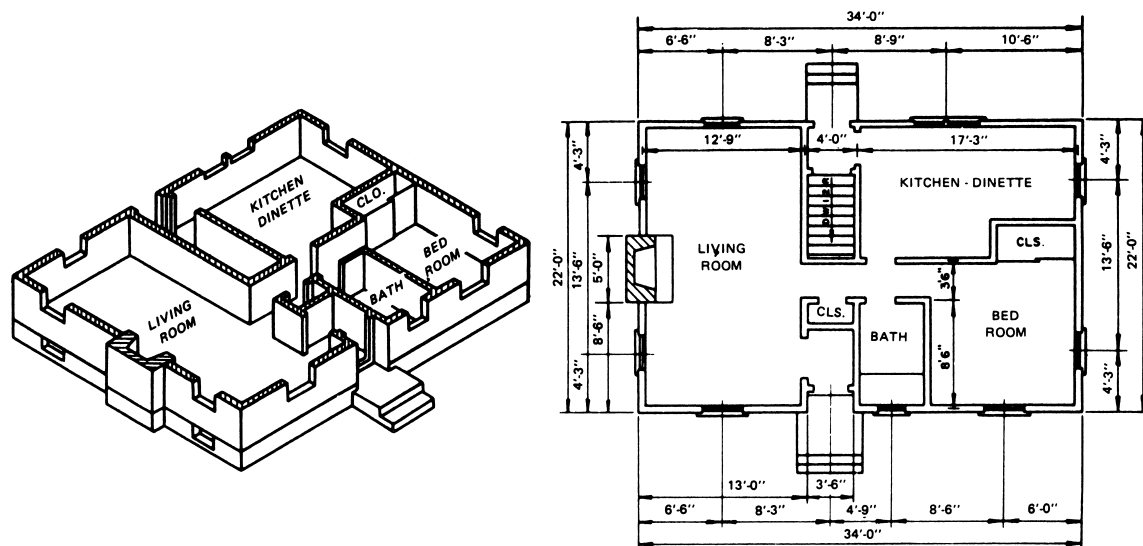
Typical floor plan. To obtain the proper view of a floor plan, assume that the top half of the structure has been removed and that the viewer is examining the exposed section from above.
